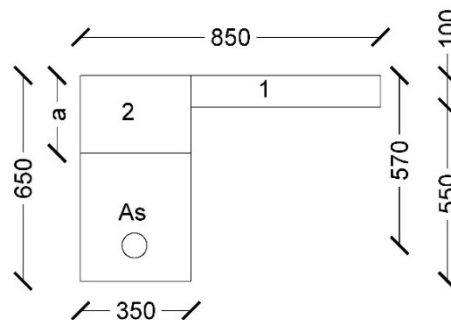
Reinforced concrete section- Example 3.5- compression zones
